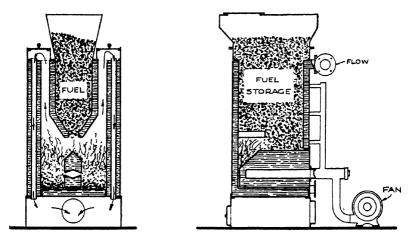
(a).—'Lumby' Forced-draught Boiler. This Boiler incorporates Magazine-feed and has no Grate-bars.
